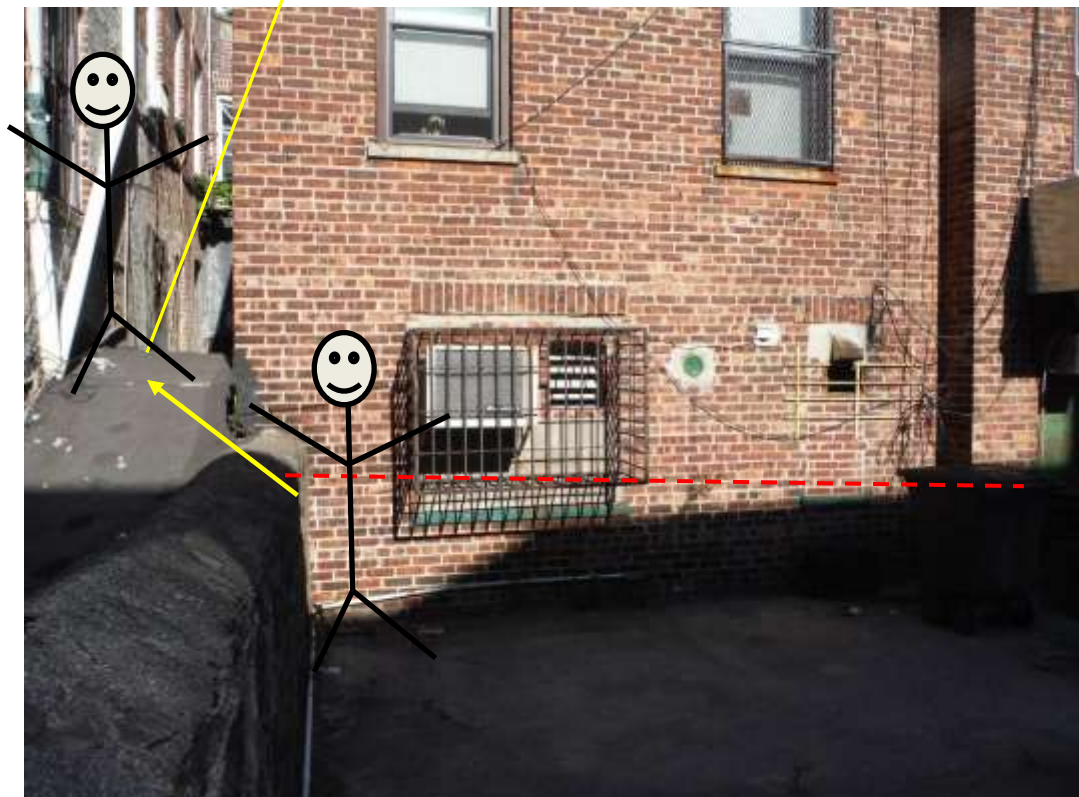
Notice the height of the garbage can to the retaining wall. The wall can easily be climbed and the shed roof walked upon. The shed roof is above a very steep drop off below; fall hazard & very dangerous. Recommend a tall grille, grate, fencing or railing on the shed roof between the buildings. See Appendix for examples of railings or safety grilles.
